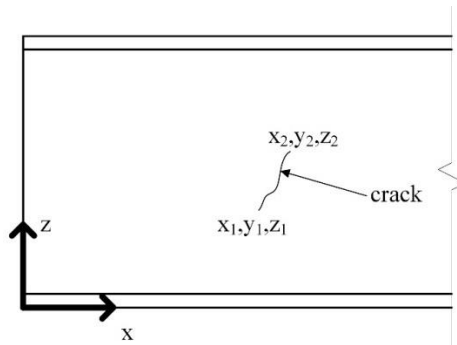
Illustration. Location of local element origin and defect coordinates on steel I-beam—elevation view.
